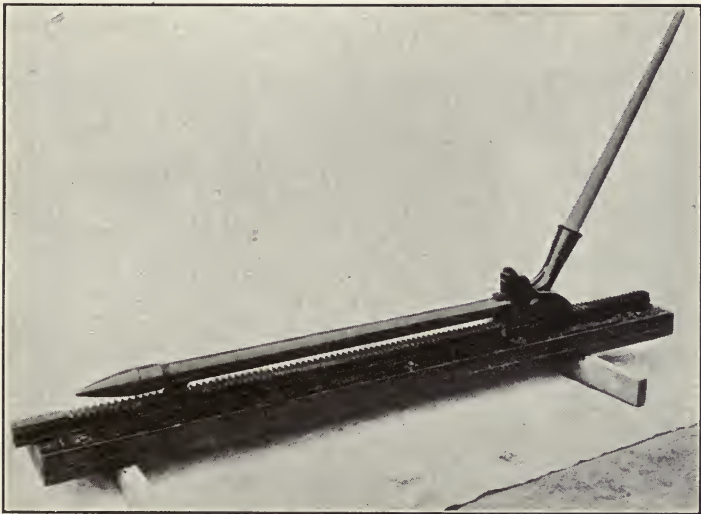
Pipe forcing jack showing pipe and steel nose mounted in position.
